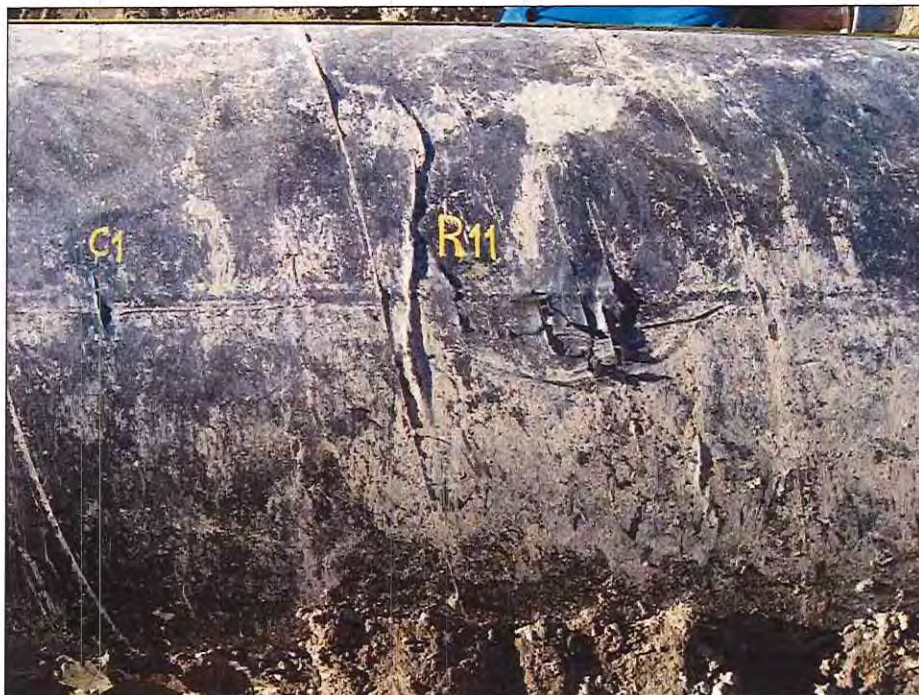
• Site 2. Open Trench. General View. Looking West.
